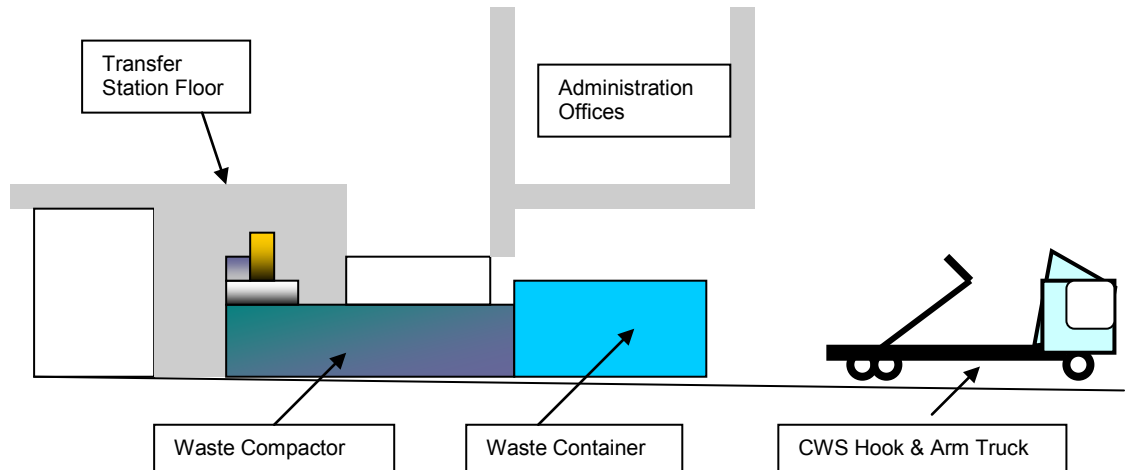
The Existing Styx Mill Transfer Station Cross Section. (Author, 2006)
